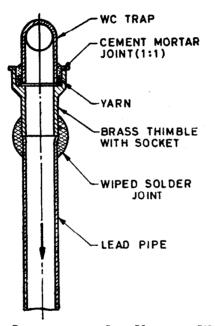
JOINTING STONEWARE OR SEMI-VITRIFIED WARE PIPE OR TRAP TO LEAD PIPE
